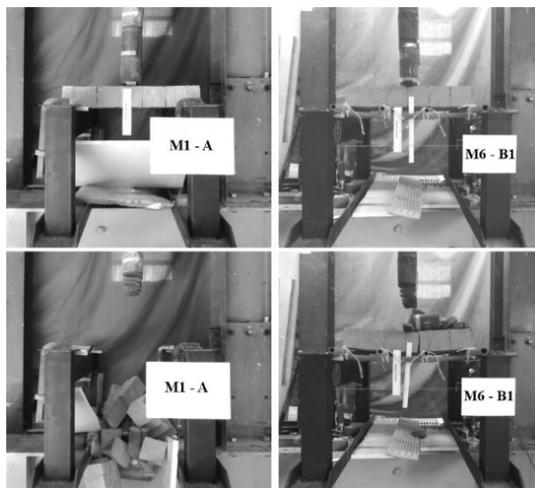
Comparison between the unreinforced wall (M1) and the wall reinforced with the bamboo frame (M6-B1).
